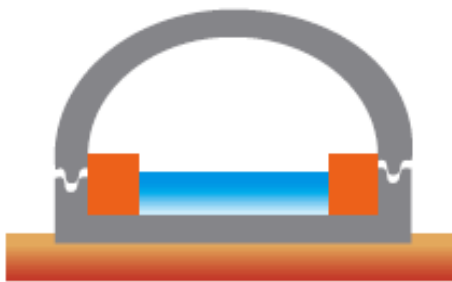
Arch connected to foundation raft. Dry-standing areas can be cast on the raft in the factory or during construction, before installing the arch
